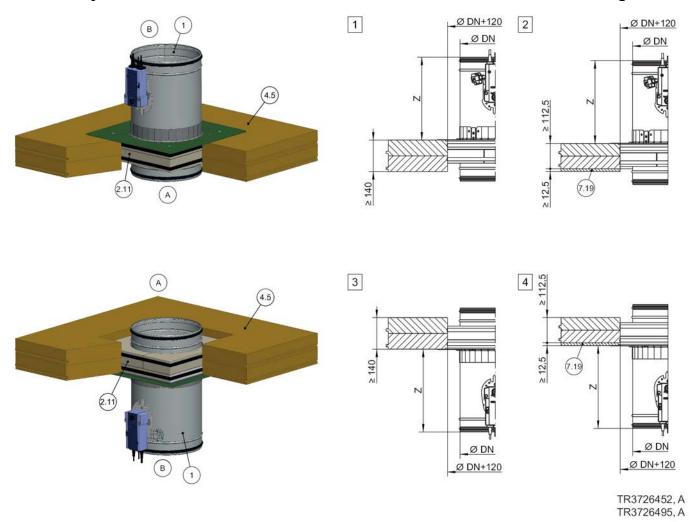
Dry mortarless installation with installation kit TQ into solid wood ceiling, upright and suspended
